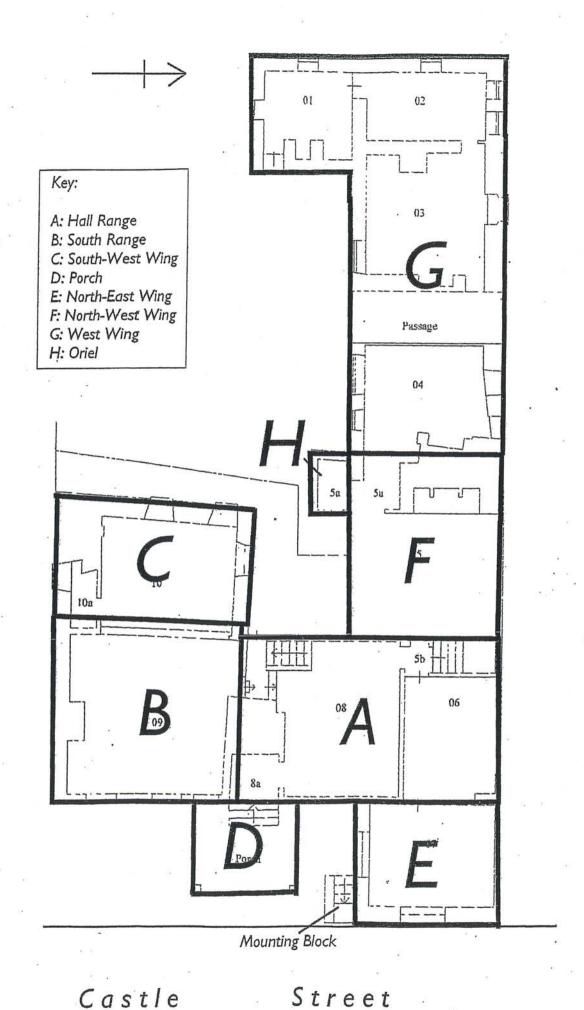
Sketch plan showing the basic building components of Nantclwyd House. Taken
